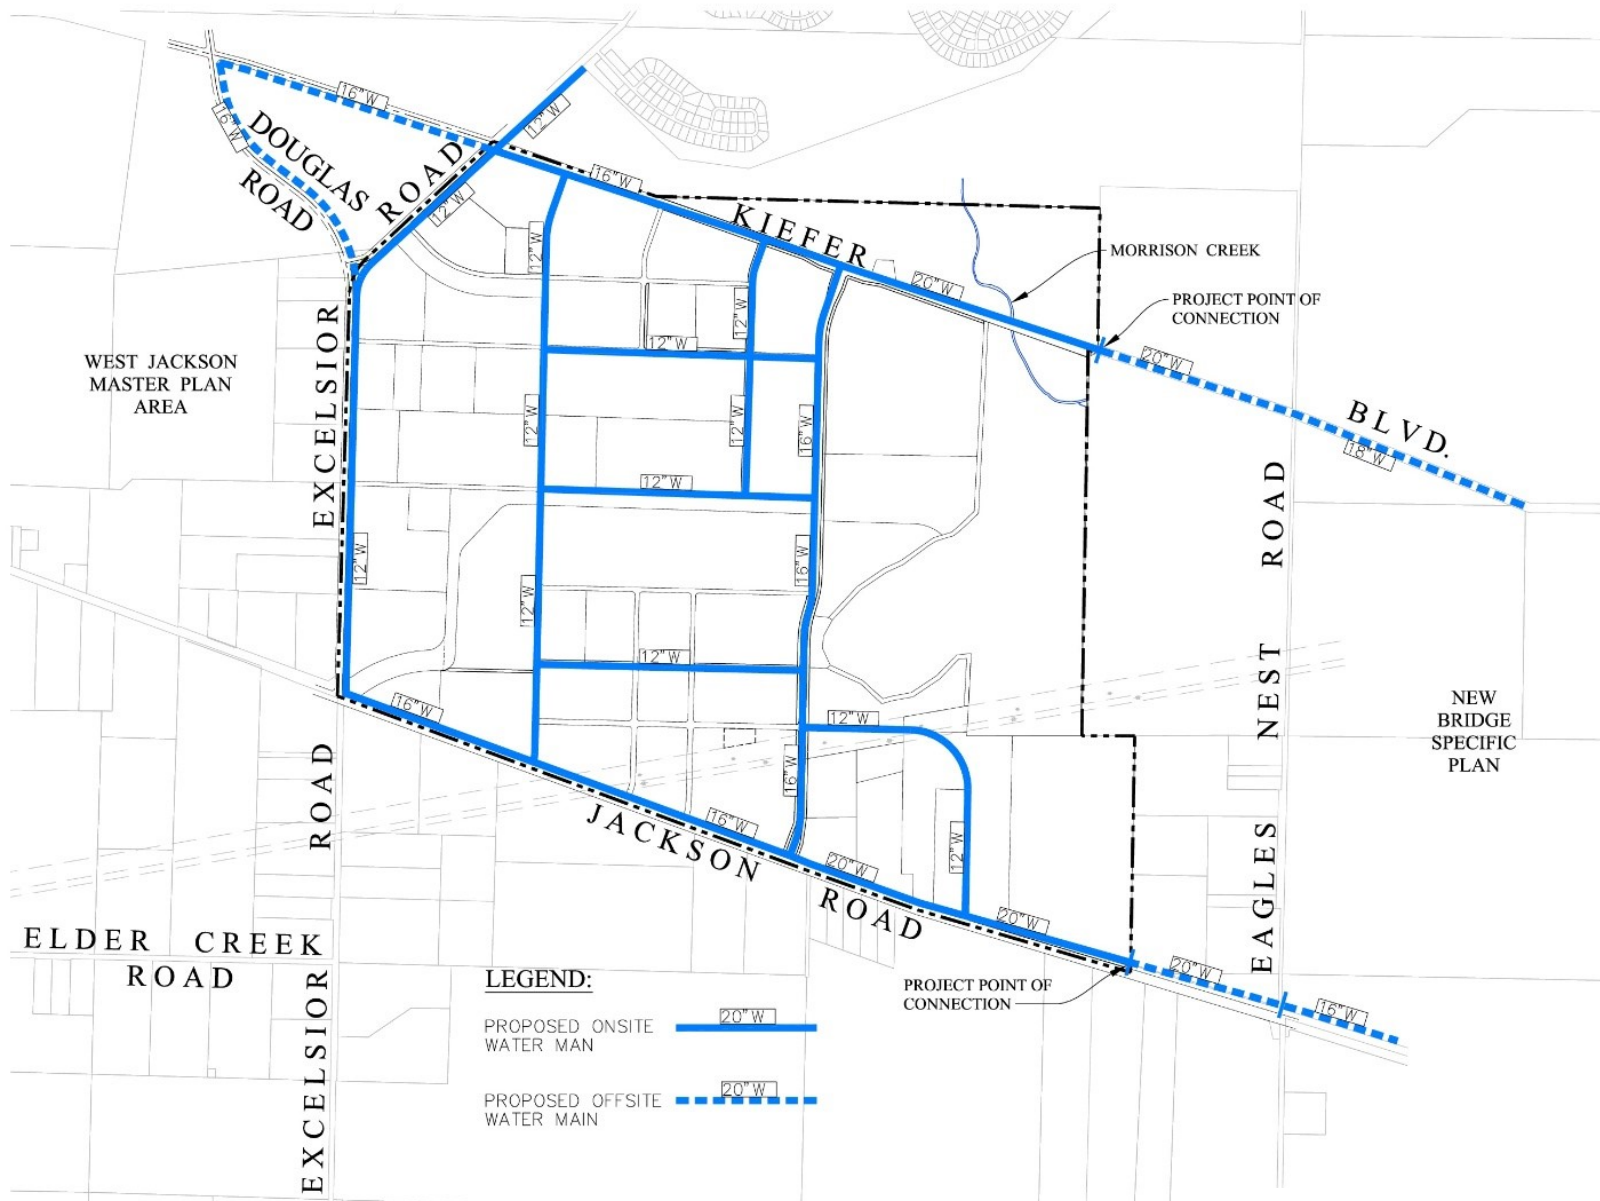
Proposed On-site Potable Water Distribution System
